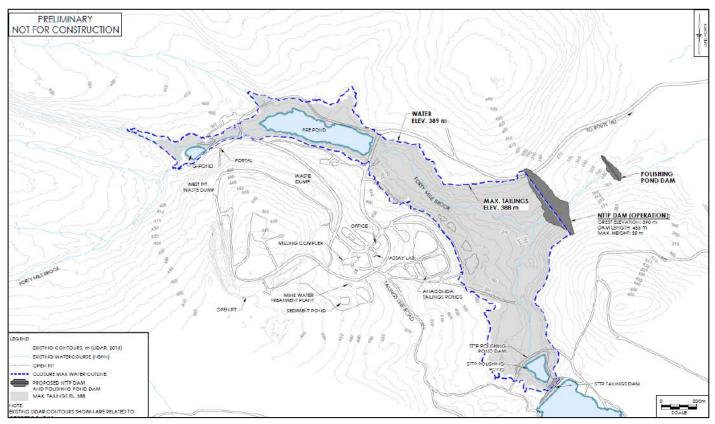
Layout of North Tributary Tailings Pond Storage Facility
